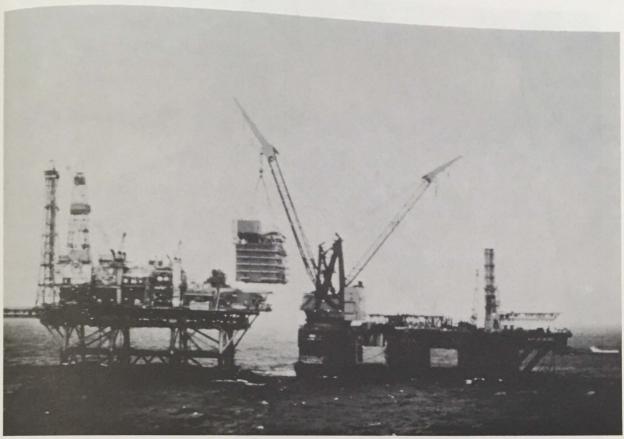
Installation of a module on the Shell Fulmar North Sea platform by a crane barge.
